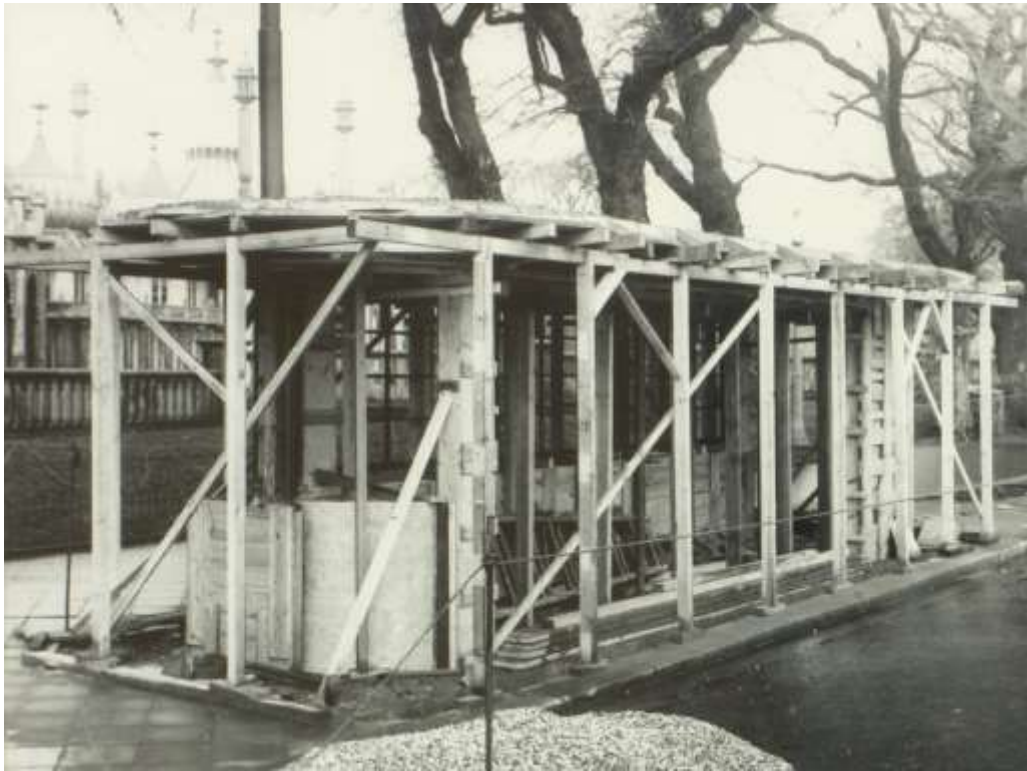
One of the Old Steine bus shelters under construction shewing the formwork for the walls and the falsework to support the casting of the roof slab.
